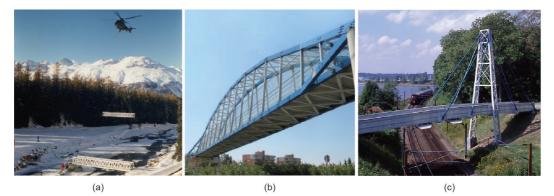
Bridge structures from pultruded profiles and material substitution (Fiberline, 2013). (a) Pontresina, Switzerland; (b) Lleida, Spain; (c) Kolding, Denmark.
